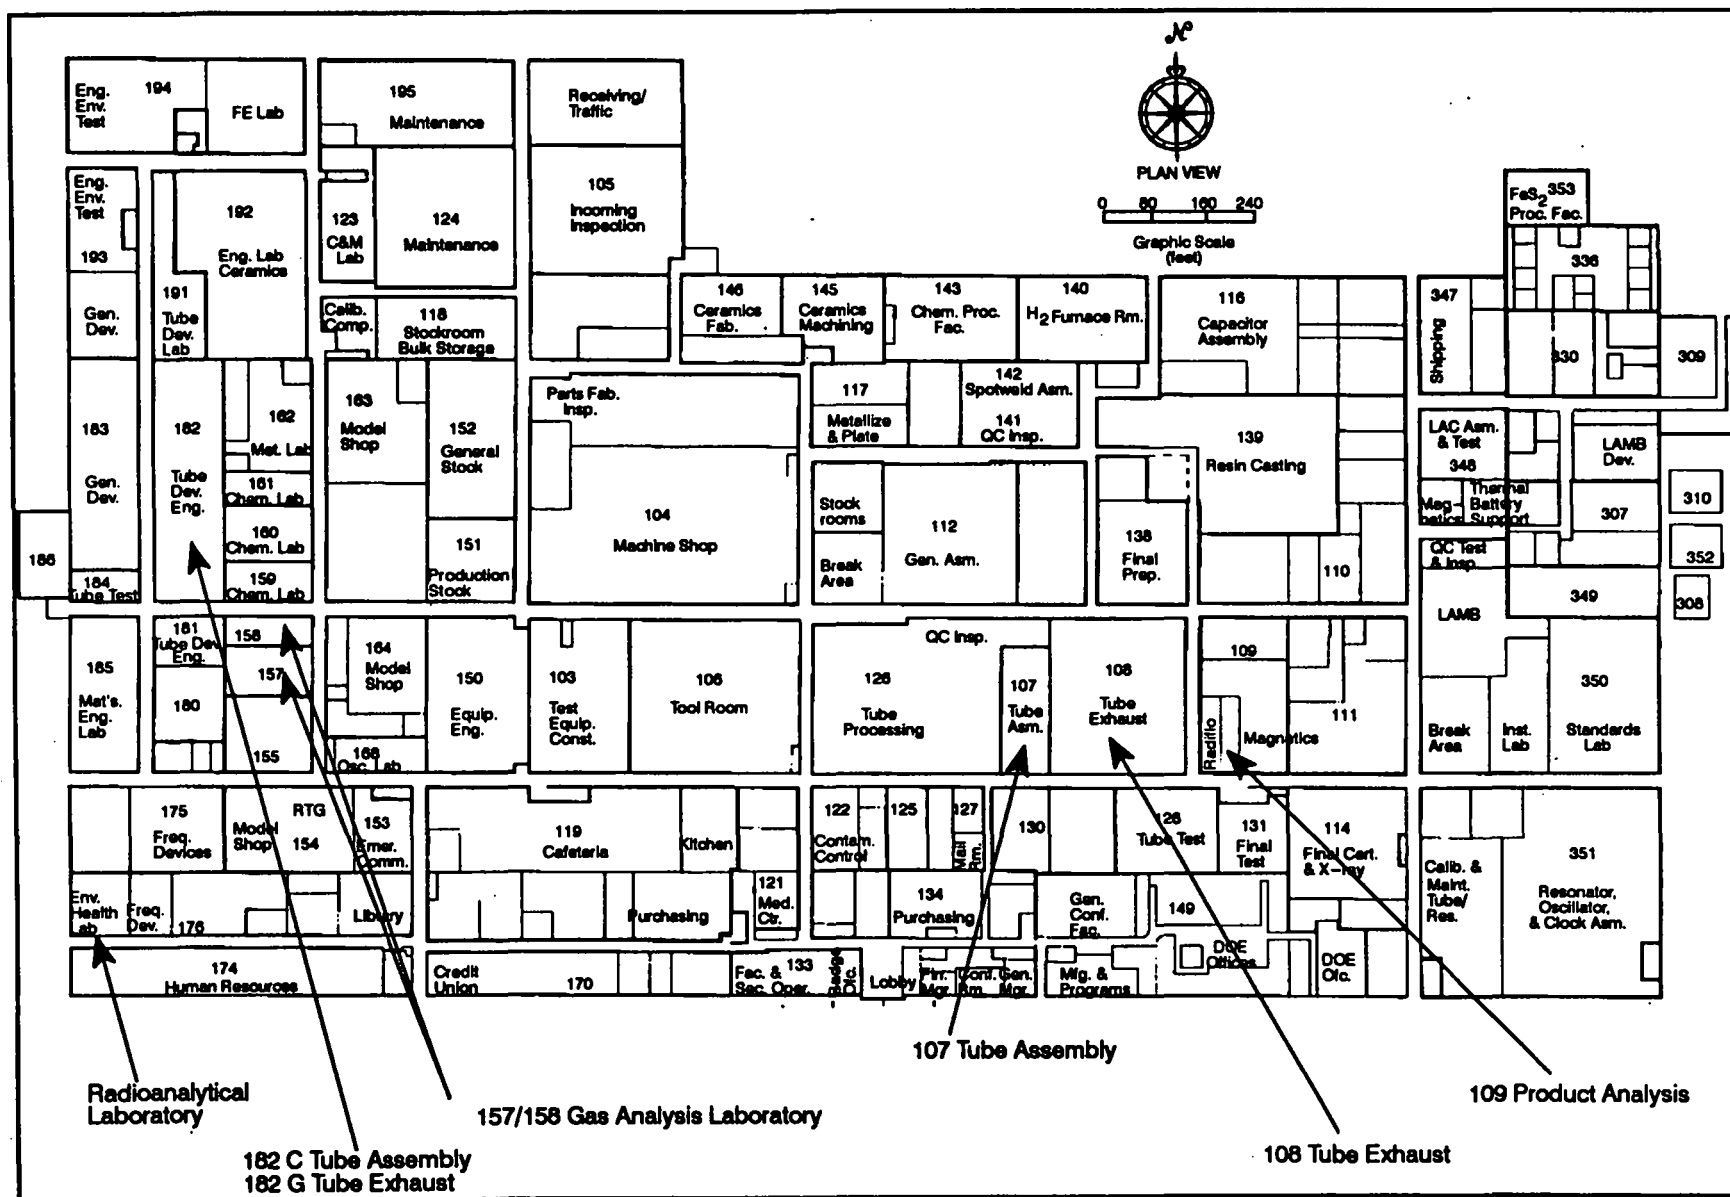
Pinellas Plant RMMAs in Existing First Floor Layout
